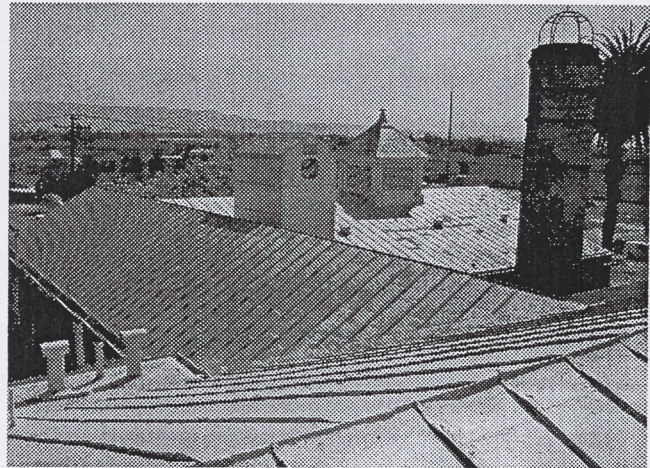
Petaluma Silk Mill – Engine/Machine Room Building
